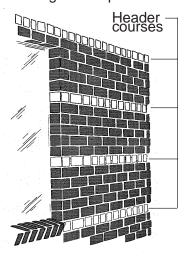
Header courses. Header courses of bricks are usually placed endwise every six or so rows in unreinforced masonry walls to tie the outer layer of bricks to the layers inside the wall.
